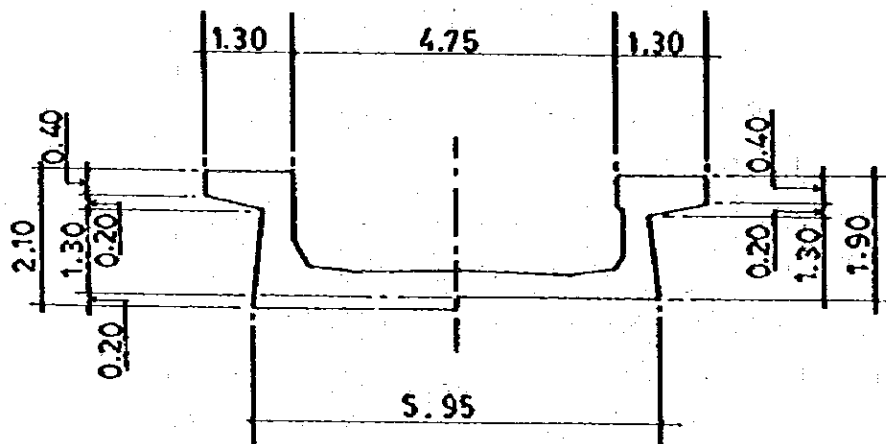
SECTION OF P.C. GIRDER FOR RAILWAY VIADUCT
